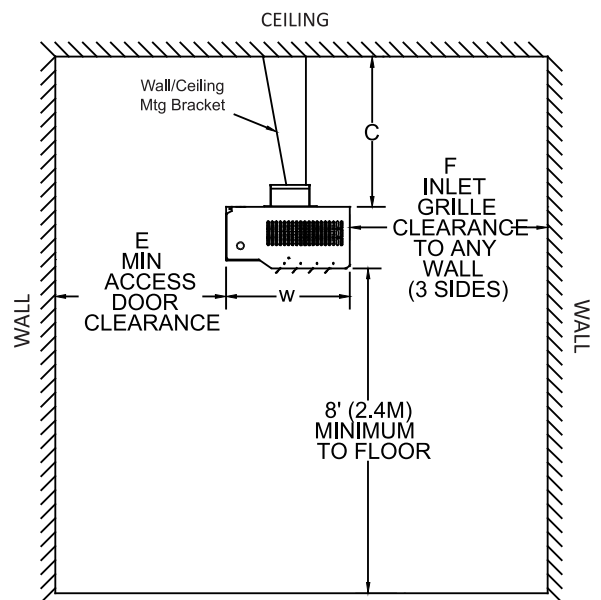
VERTICAL CEILING MOUNT WITH MTG ARM
